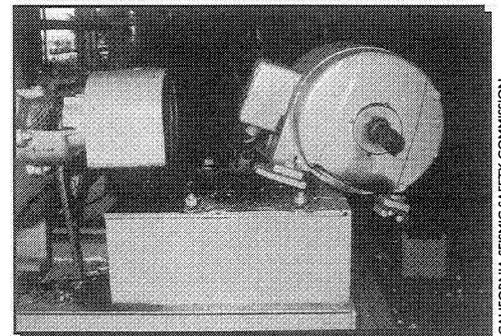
Bolting equipment. Light equipment can be bolted to a concrete floor with expansion bolts. For methods of securing heavier equipment, consult an engineer. (BAREPP)
